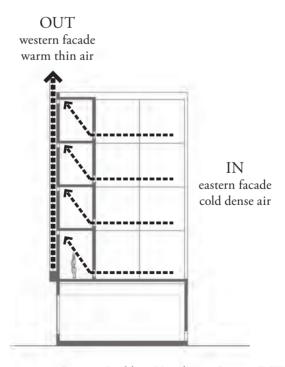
32 - Support Building Ventilation Section E-W (Source: Author. 2013)
